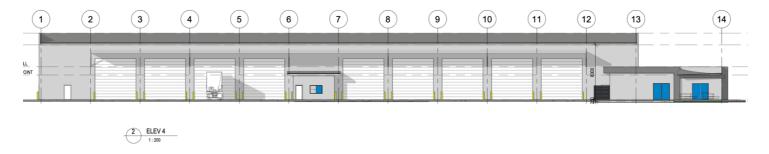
Proposed Warehouse (Source: Proposal Plans prepared by McDonald Construction)
